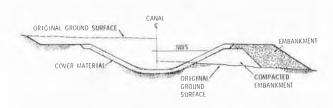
Profile of a Typical Earth Lined Canal With Underlayment of Plastic.
